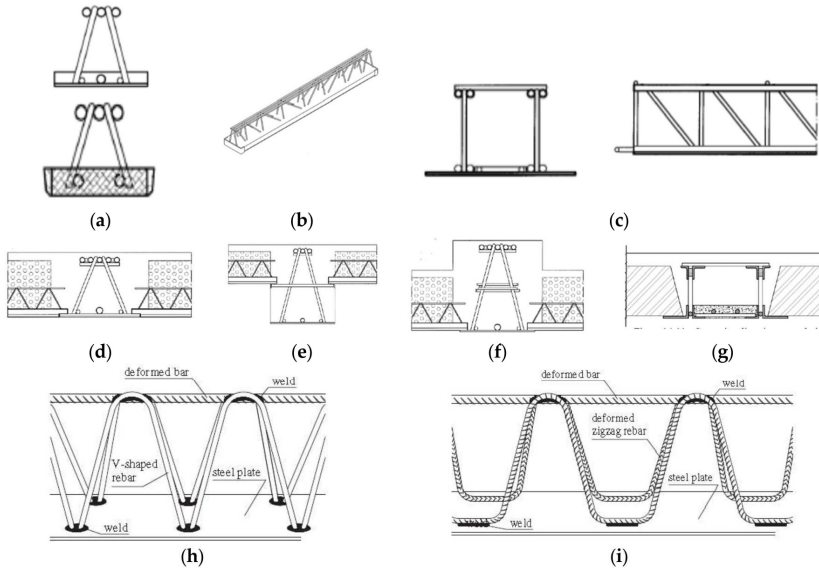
HSTC beams characterized by: steel plate or precast prestressed concrete slab (a), spatial truss (b), multi-planar truss (c), slab beam with bottom steel plate (d), regular (downstand) (e), inverted (upstand) (f), slab beam with bottom chord constituted by steel angles (g), transverse reinforcement realized with bent bars having V shape (h), transverse reinforcement made of continuous bent bars (i) (taken from Colajanni et al. 2018a)
